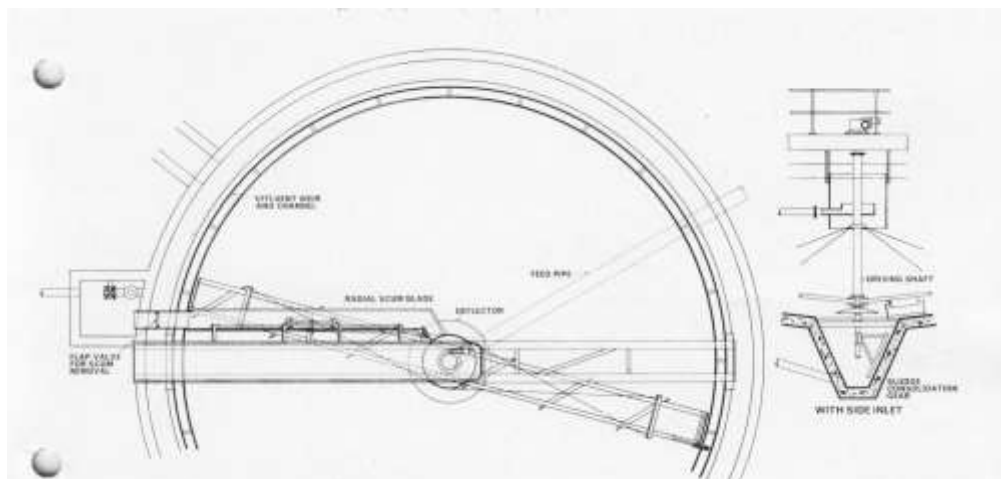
SCRAPER BLADES IN ECHELON LAYOUT.
